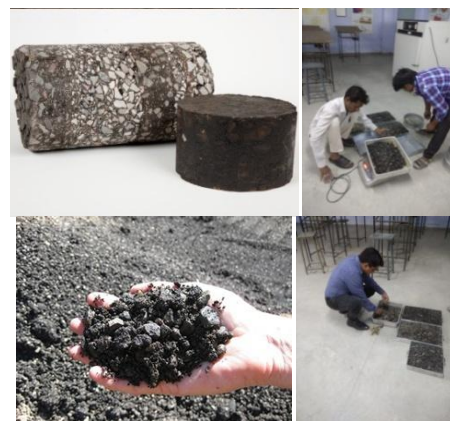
Core and Crushed Sample of Reclaimed Asphalt Pavement
